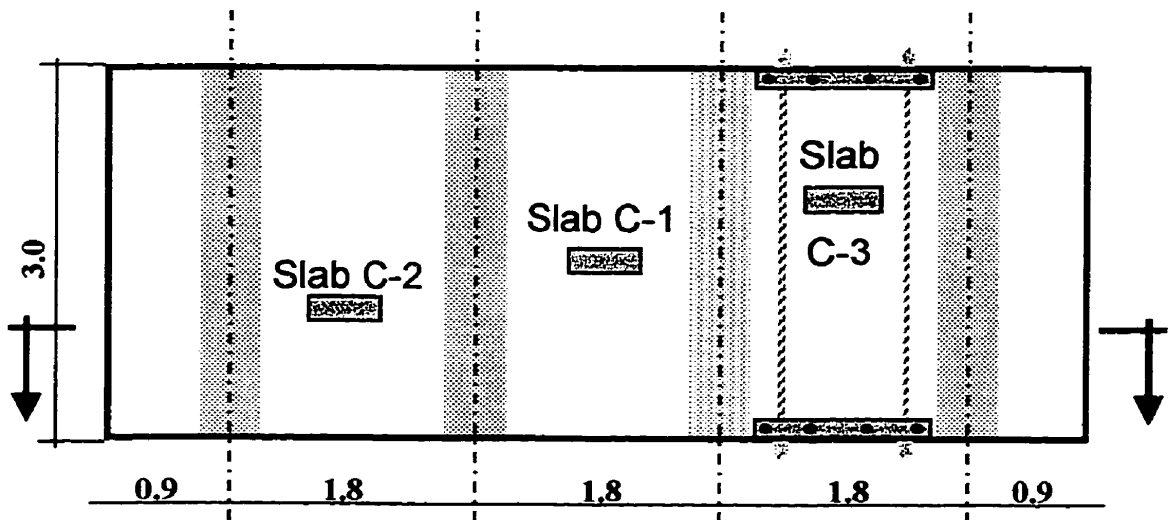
Plan View of CFRP-Reinforced Slab and Test Locations
